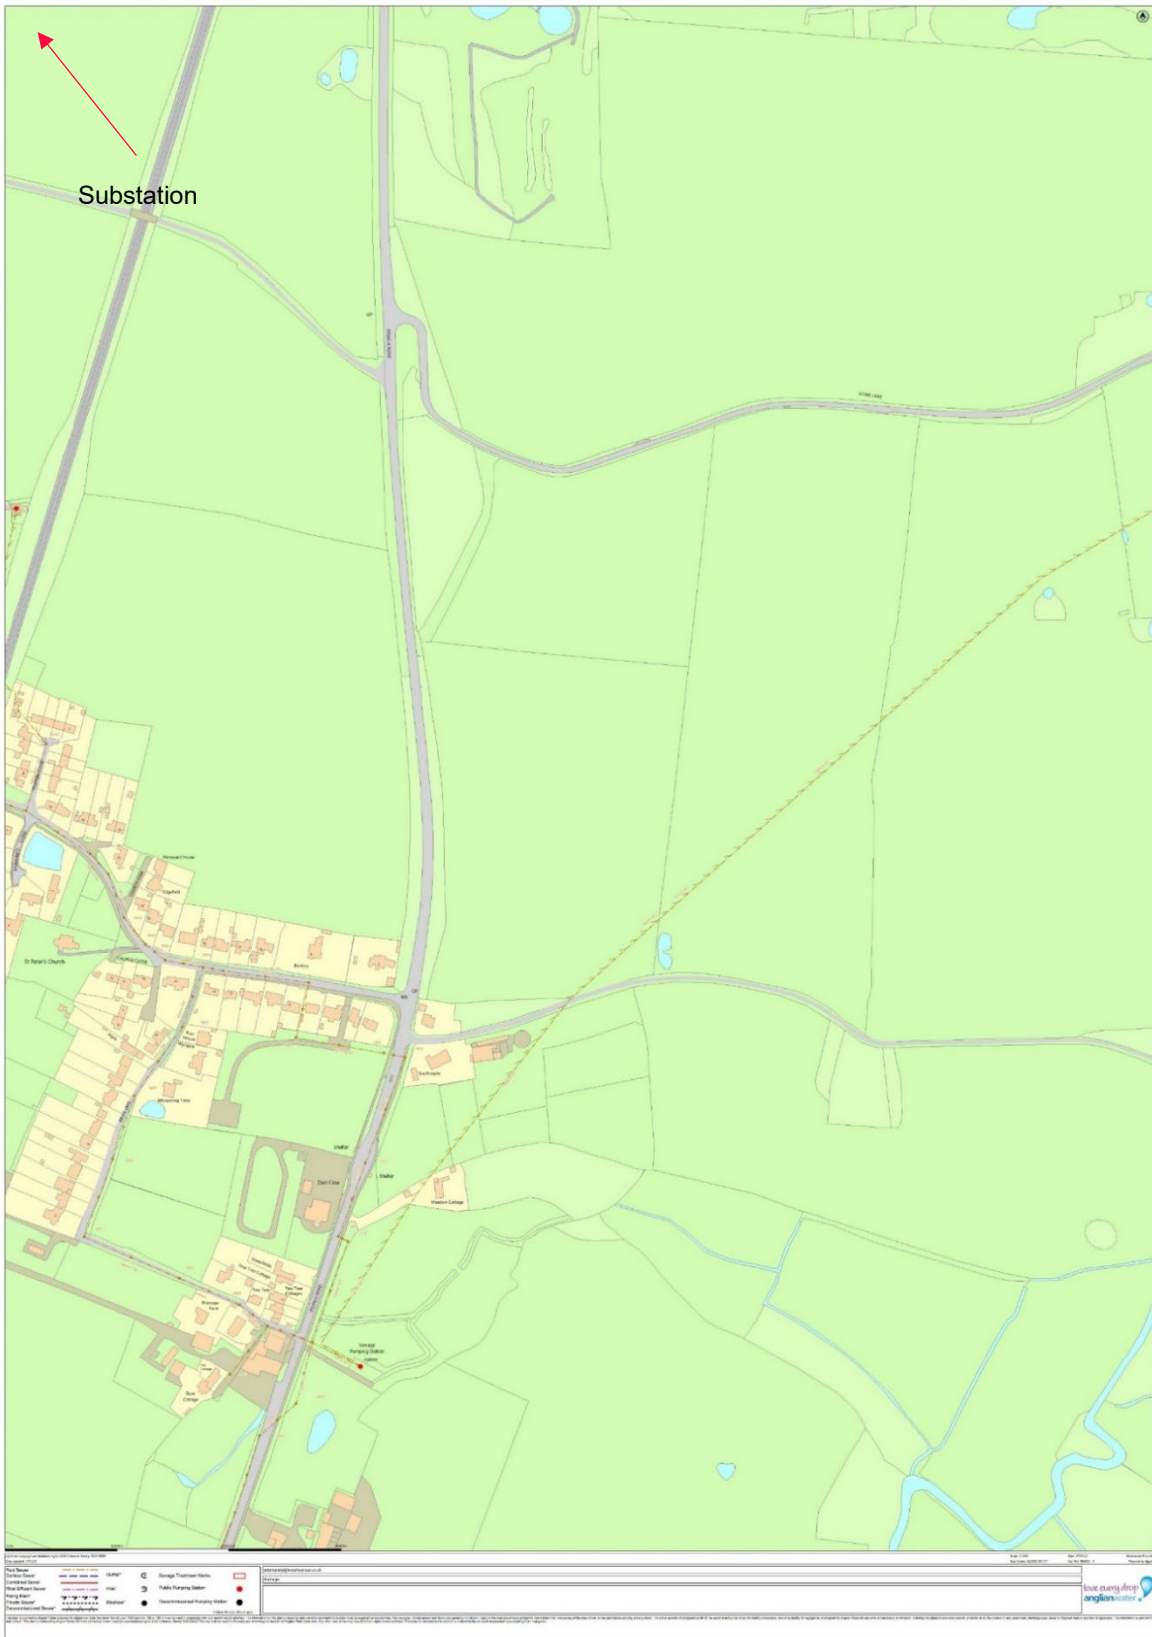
Anglian Water Drainage Plans for Land to the South and East of the Proposed Onshore Substation
